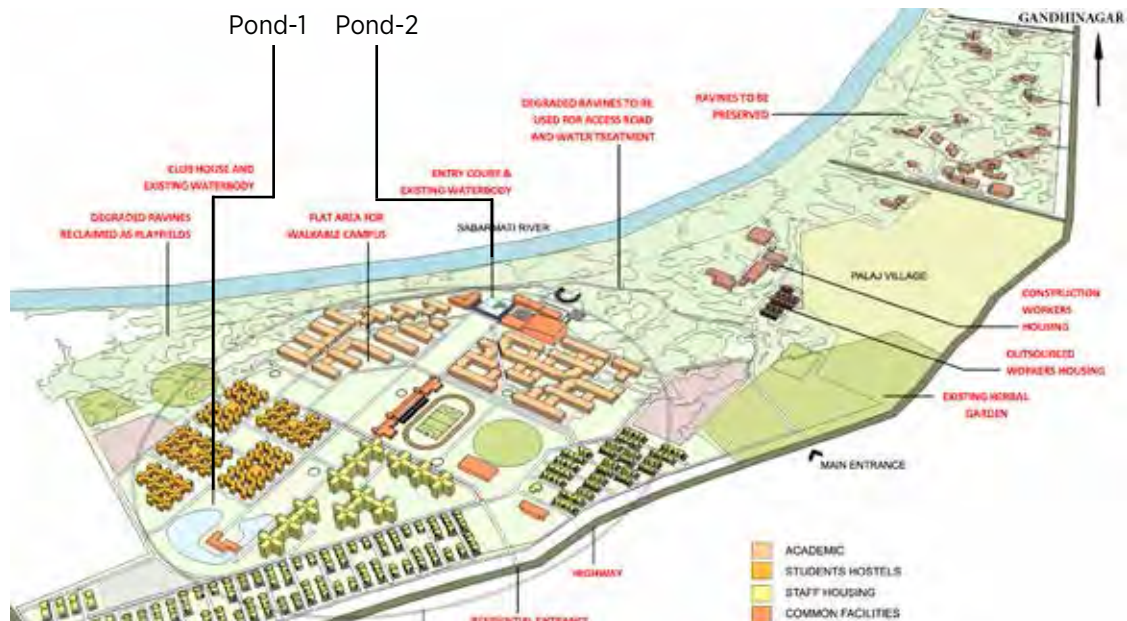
Plan of campus showing the location of the 2 seasonal ponds
